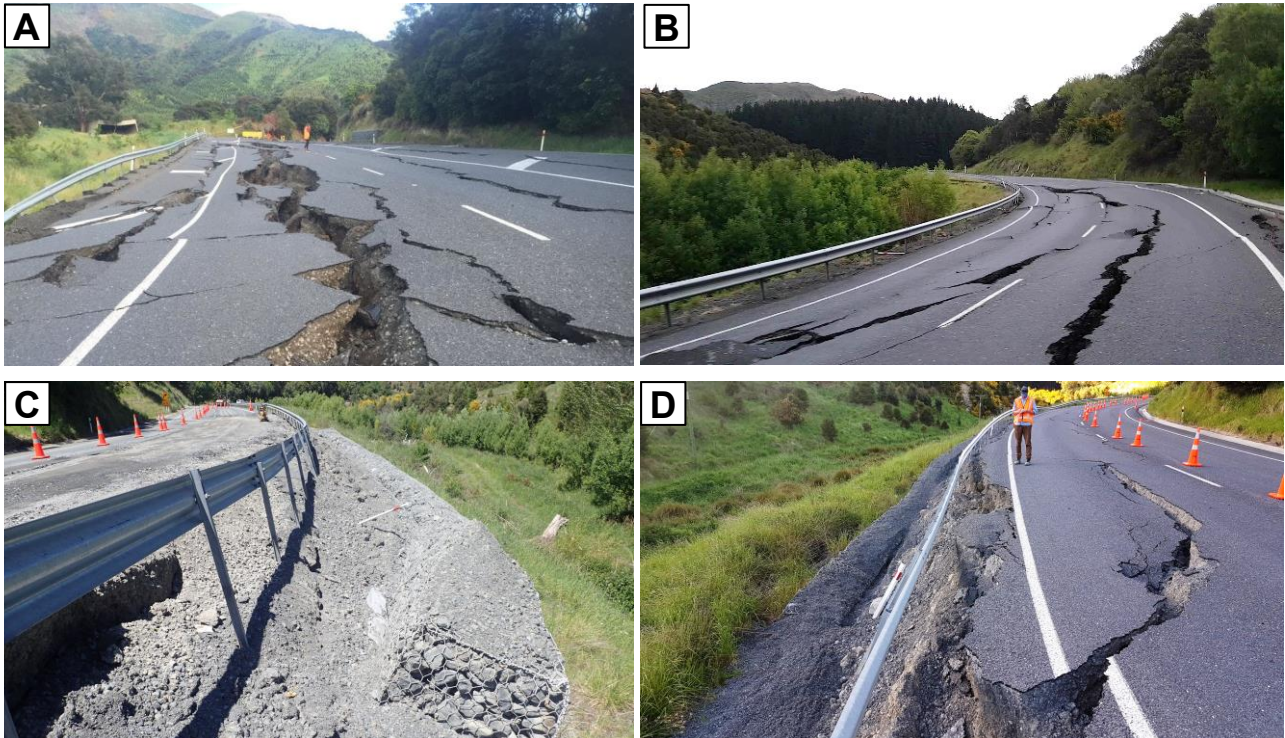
Major damage to slope assets along the Hundalee Forest section of SH1. (A) Translational failure of a gabion wall and spreading of the road embankment at RP 185/2.65 (photo credit: stuff.co.nz). (B) Displacement of a gabion wall and the road embankment at RP 185/3.05 (photo credit: D. Coll). (C) Overturning failure of an unreinforced gabion wall (photo credit: M. Broughton). (D) Translational failure of a gabion wall and slumping of the road embankment (photo credit: K. Jadrnicek).
